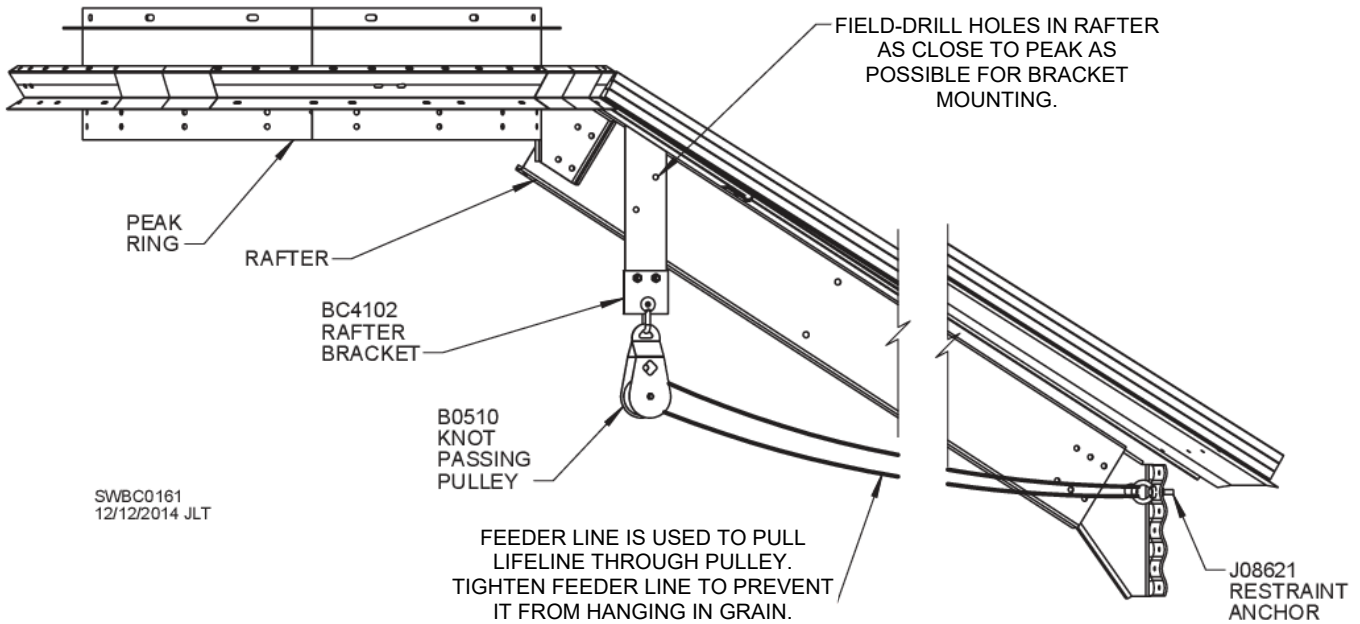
Mount knot-passing pulley close to peak ring (single rafter shown)
